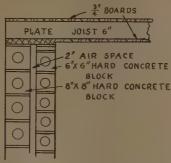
Detail of wall and ceiling construction of Storage G.
